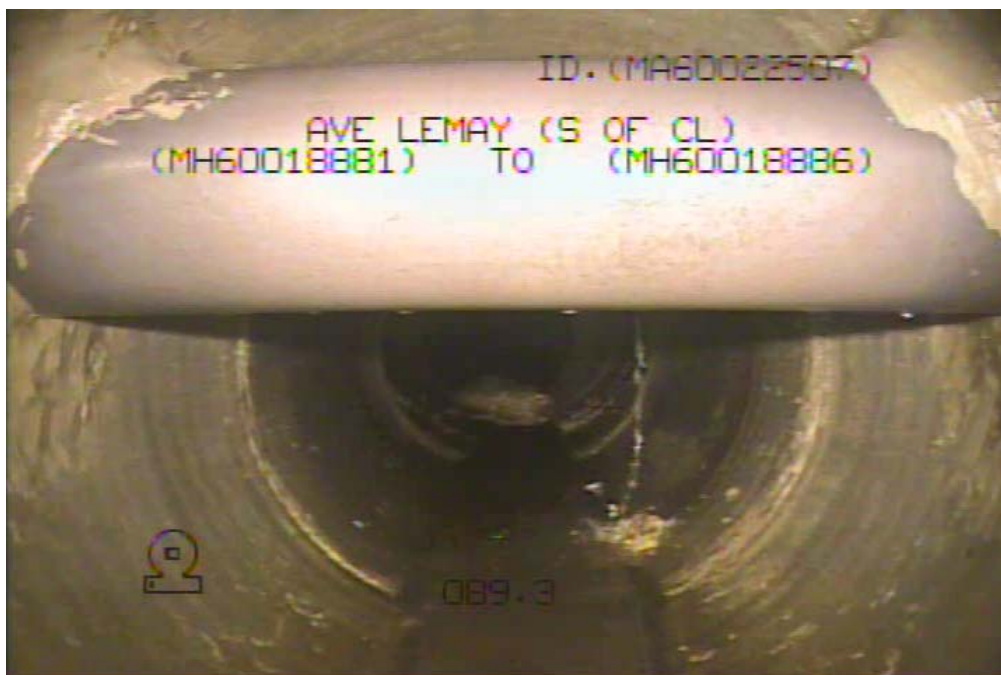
200 mm diameter wastewater sewer through 900 mm diameter land drainage pipe on Avenue Lemay.
